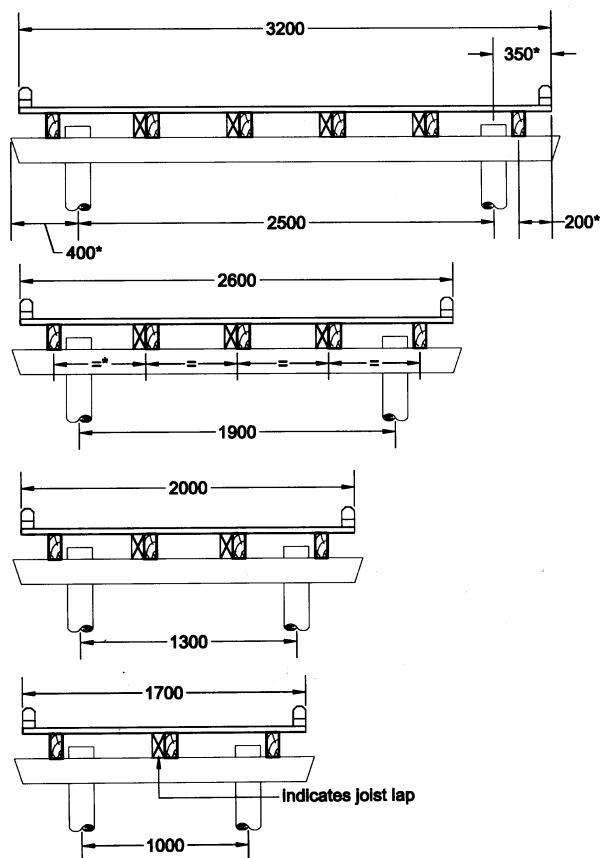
Typical Framing Layout for Pedestrian & Cycle Boardwalks
